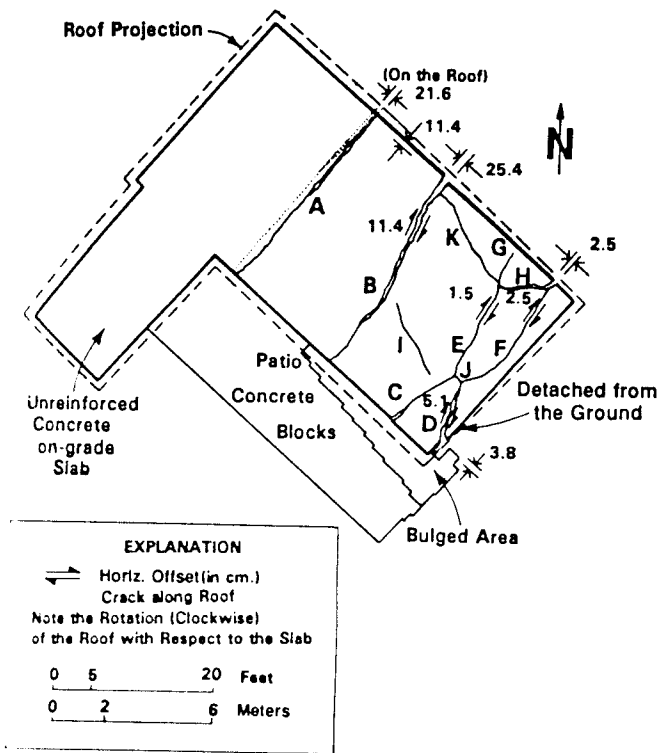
Distribution of cracking in the unreinforced concrete slab at the Kickapoo Trail site.
